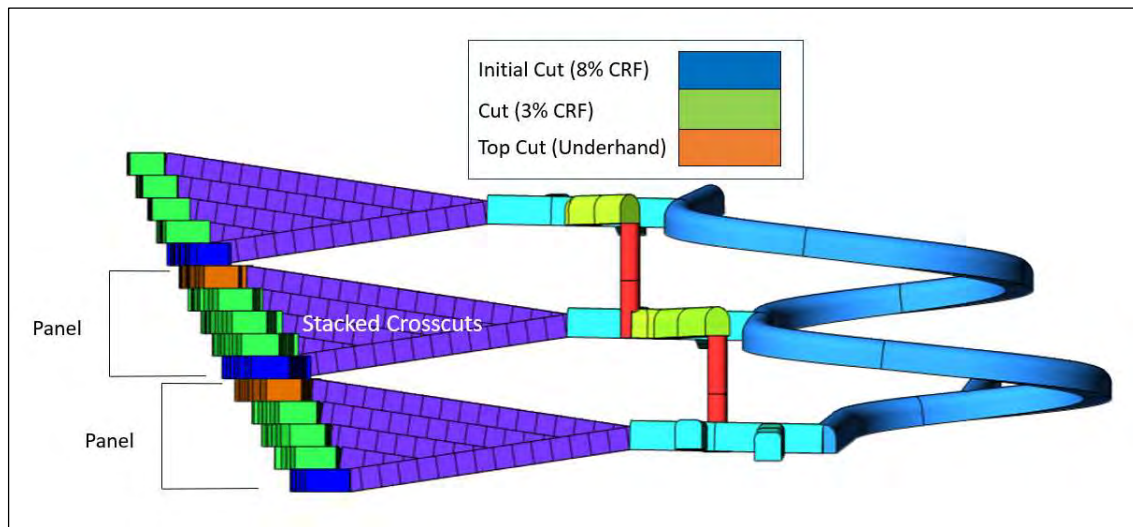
Mechanized Cut and Fill Mining Method Layout.
